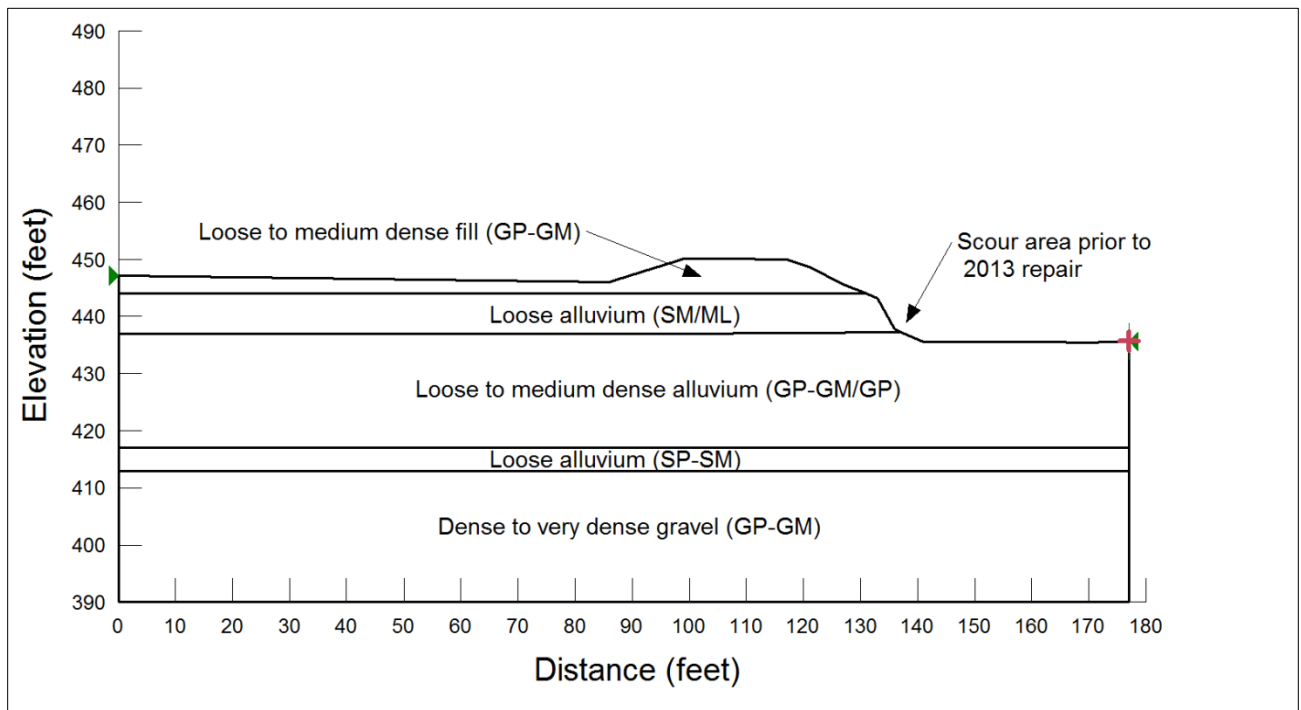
Levee Cross Section, Critical Section Location G-5
